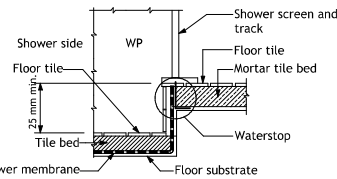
Typical enclosed stepped down shower construction (membrane above tile bed)
